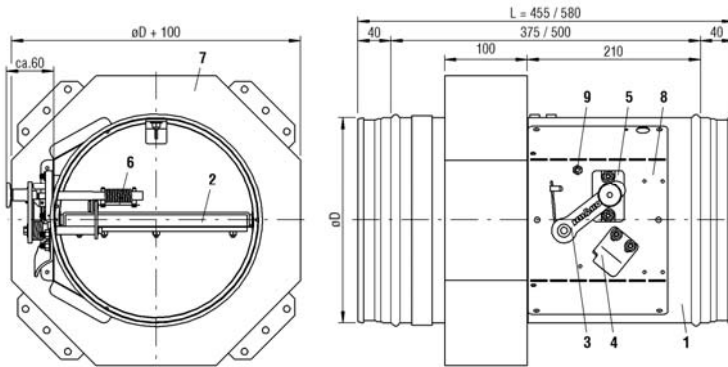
Dimensions of the BSK-RPR-S with mounting frame AR
